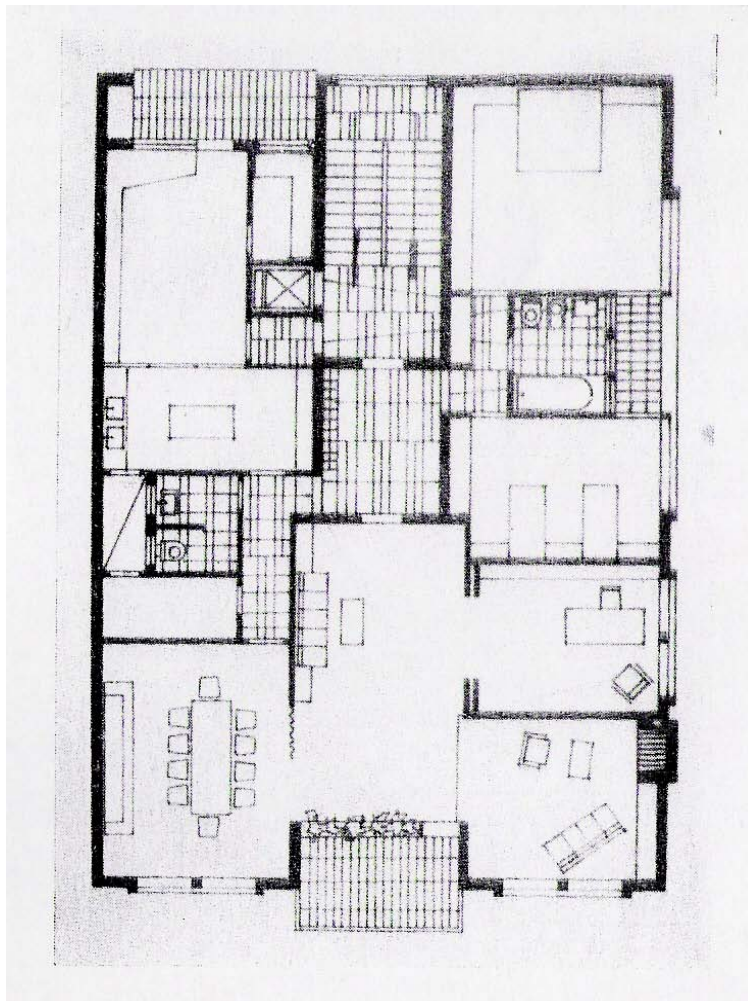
Floor plan of cooperative residential building on Oborishte St., Architect Angel Damyanov
